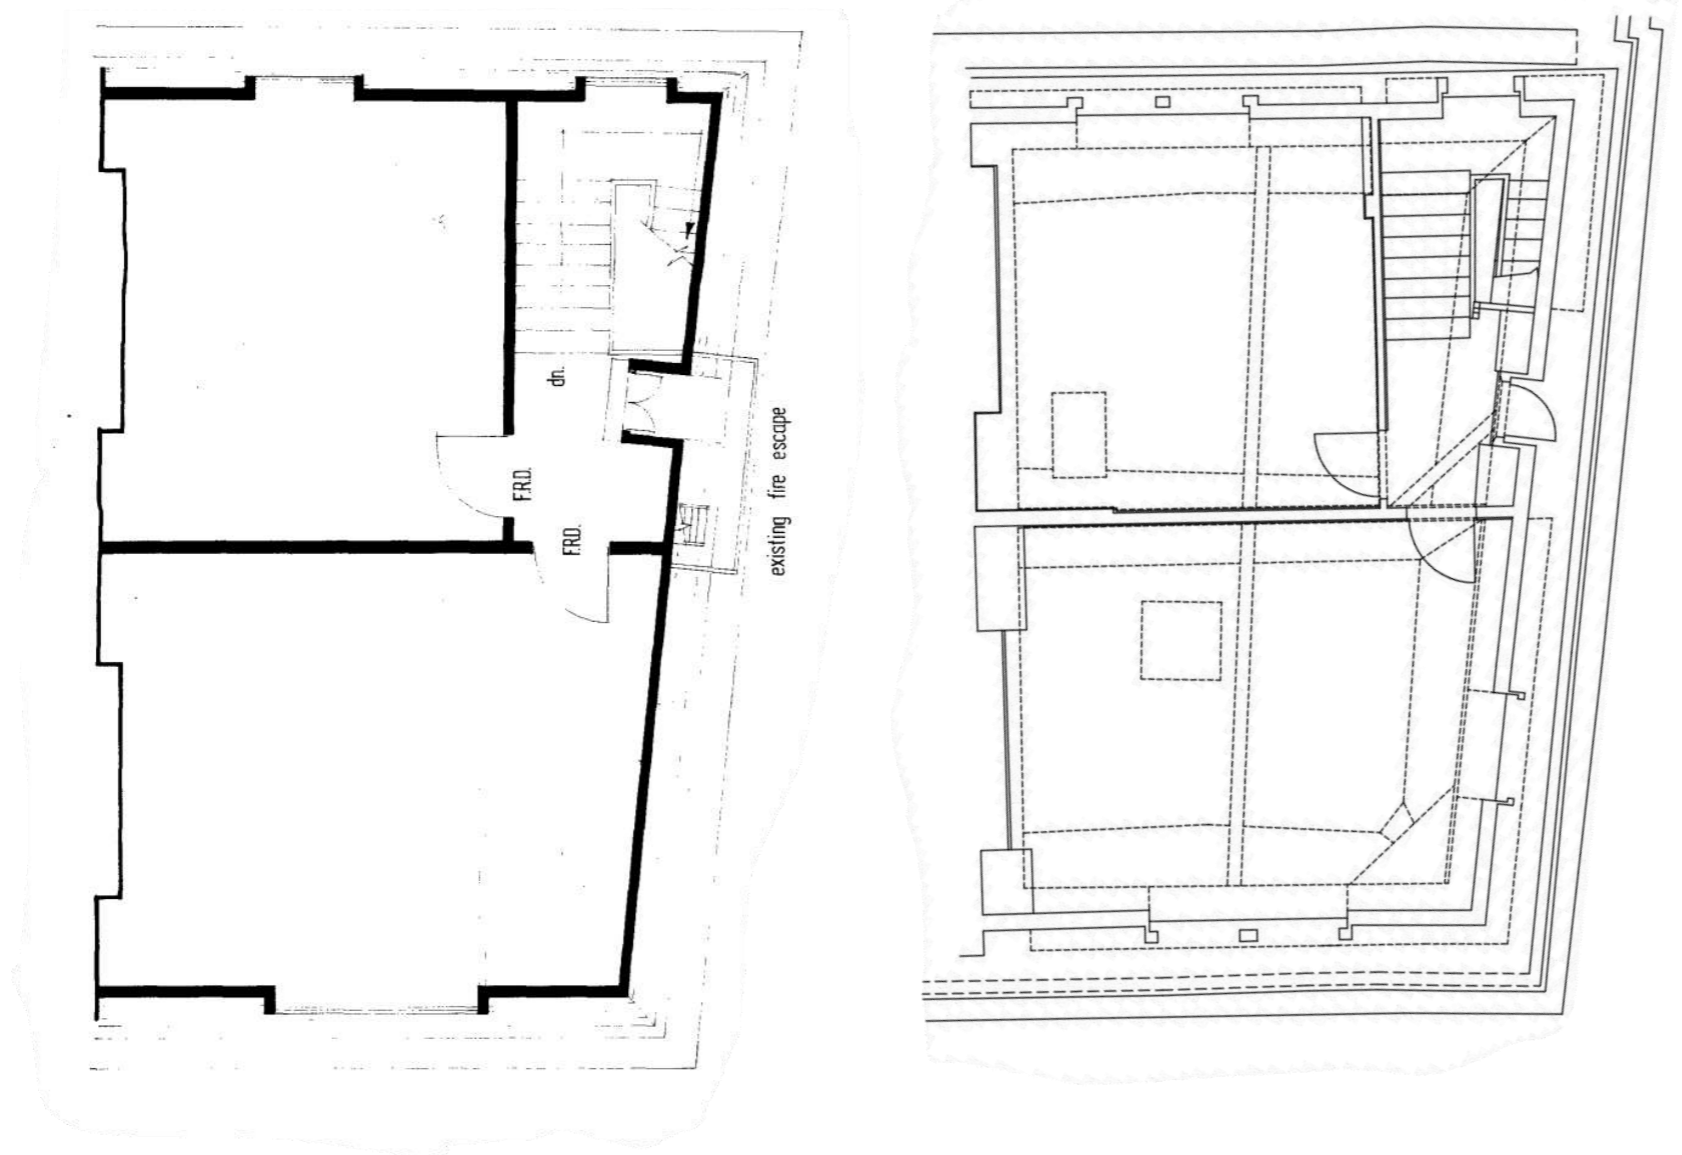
Third Floor, 1970 plan (left) and existing plan (right).
